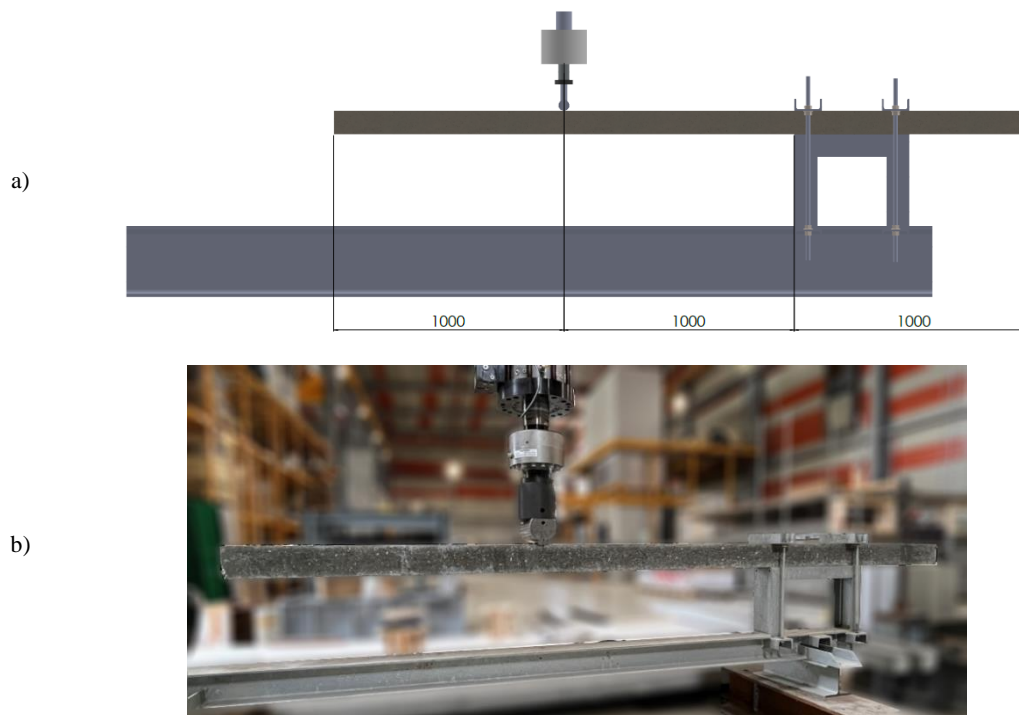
Test set-up for the bending tests of the columns (dimensions in mm): a) Scheme; b) Photograph.
